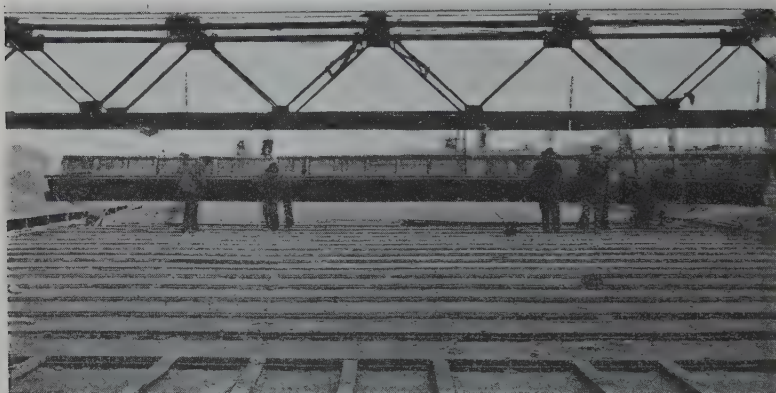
CASTING YARD FOR CONCRETE PILES.
